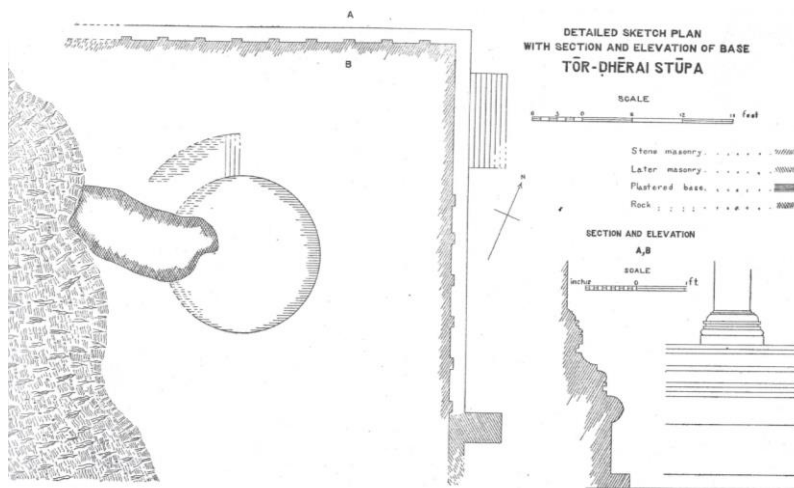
Plan, elevation and details of Tor Dherai stupa (after Stein 1929: 7).
